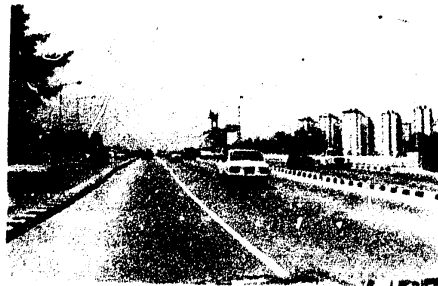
Nicoll Highway is concrete, 7 lanes wide, and divided by a 3-lane center section (U/OU)
